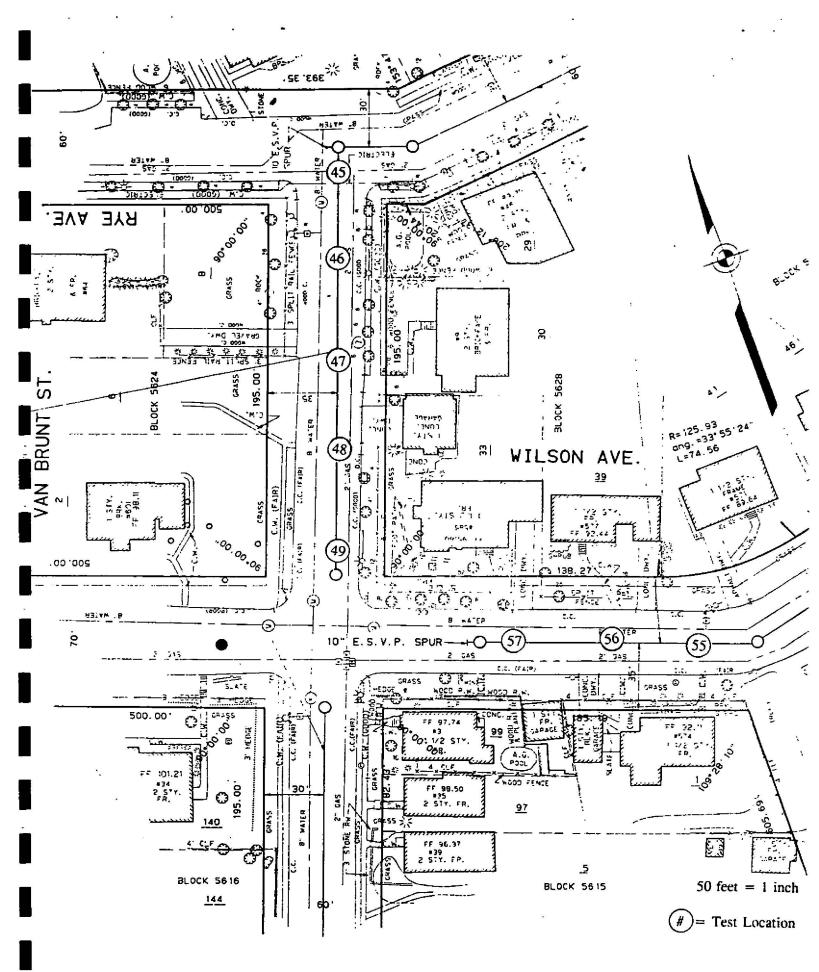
Planned Phase 1B shovel test locations on Van Brunt Street and Wilson Avenue.
